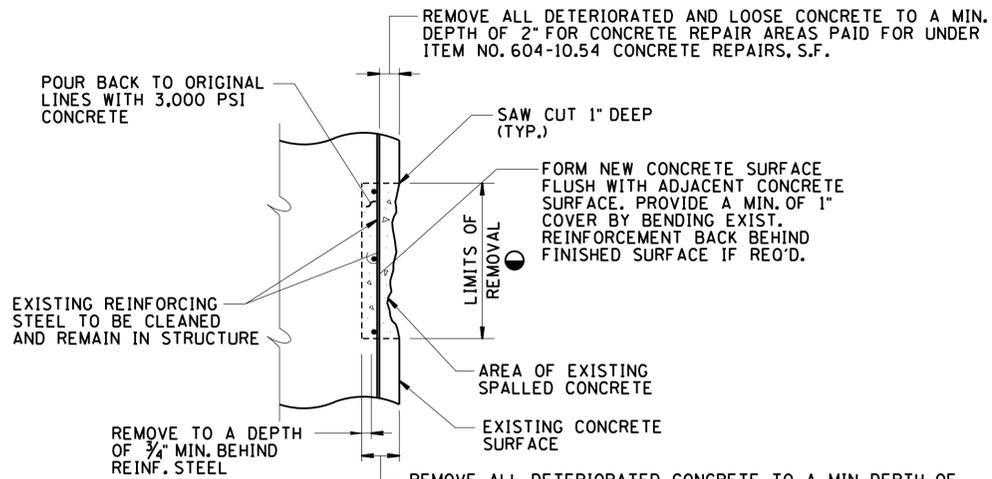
DETAIL SHOWING AREAS OF EXISTING SPALLED CONCRETE SURFACES TO BE REMOVED AND REPAIRED
